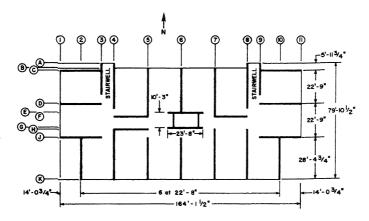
TYPICAL FLOOR PLAN - 2ND THRU 12TH FLOORS
